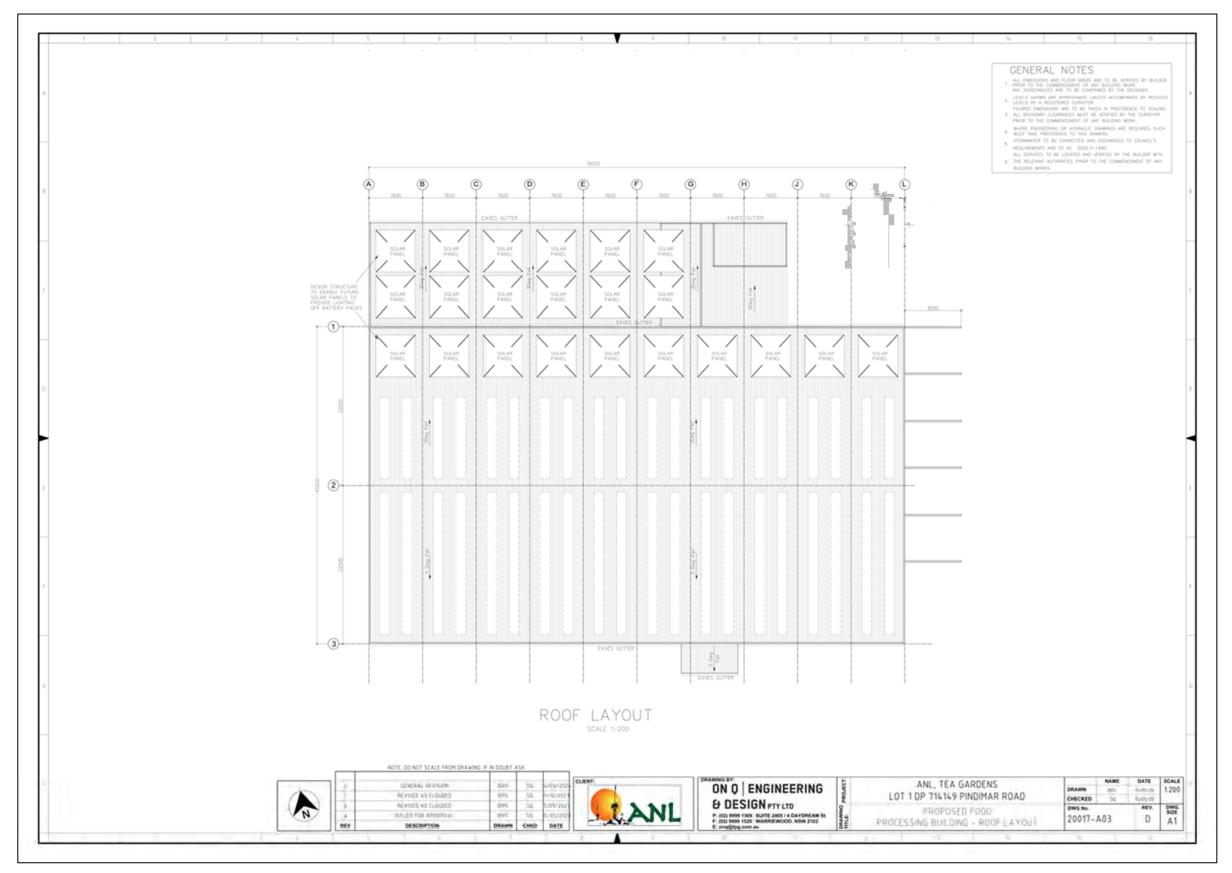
Roof layout for the proposed extension of approved wood waste processing building for the FOGO processing operation transition at the Tea Gardens Facility
